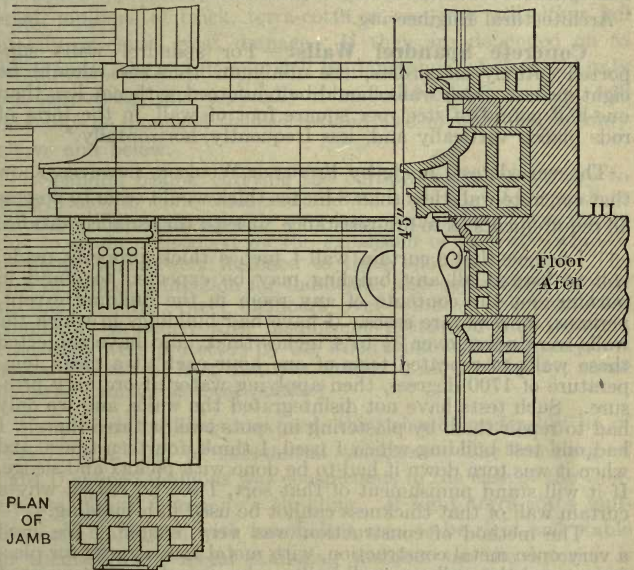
Spandrel Section, 3rd Floor, Copley-Plaza Hotel, Boston.
